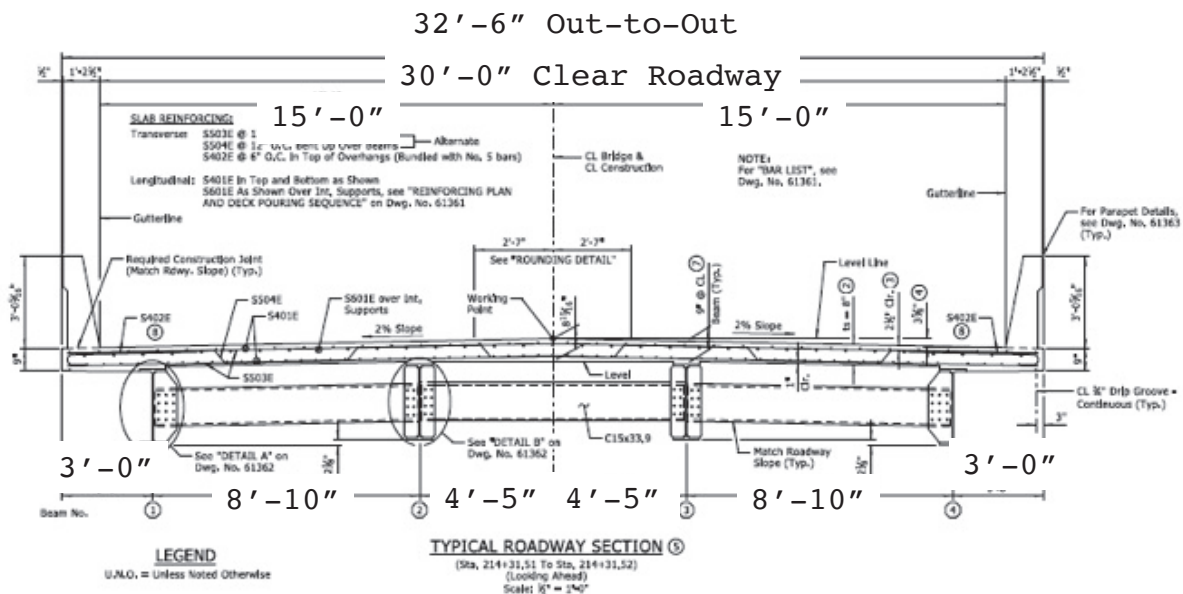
Highway 308 Bridge Cross-Section (ARDOT AR308 Over Ditch Nos. 1&47, Bridge Cross-section, 2020)
